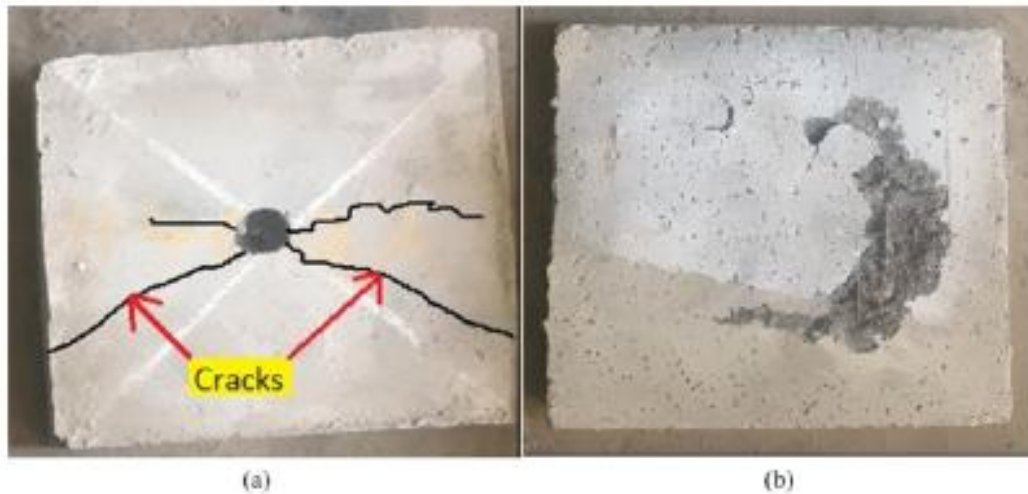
Typical failure of ferrocement (a) on the front face, (b) on the rear face.
